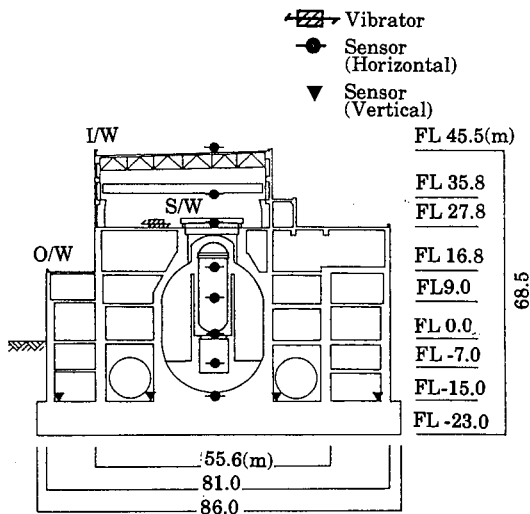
Cross Section of Reactor Building and Testing Arrangement for Vibration Test
